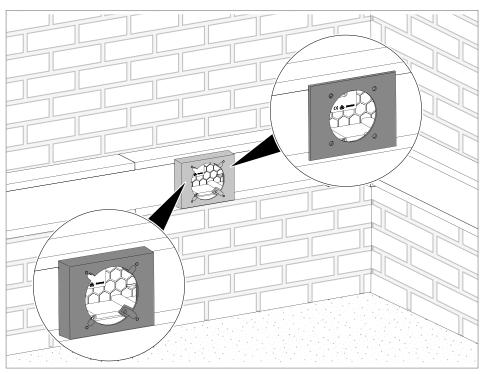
Mounting the CEE intermediate flange/CEE panel
